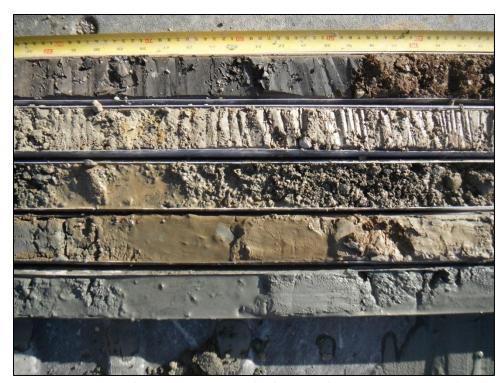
Core samples from TBL 12, center of 4-foot units from top to bottom: 0-4 feet, 4-8 feet, 8-12 feet, 12-16 feet, 16-20 feet.
